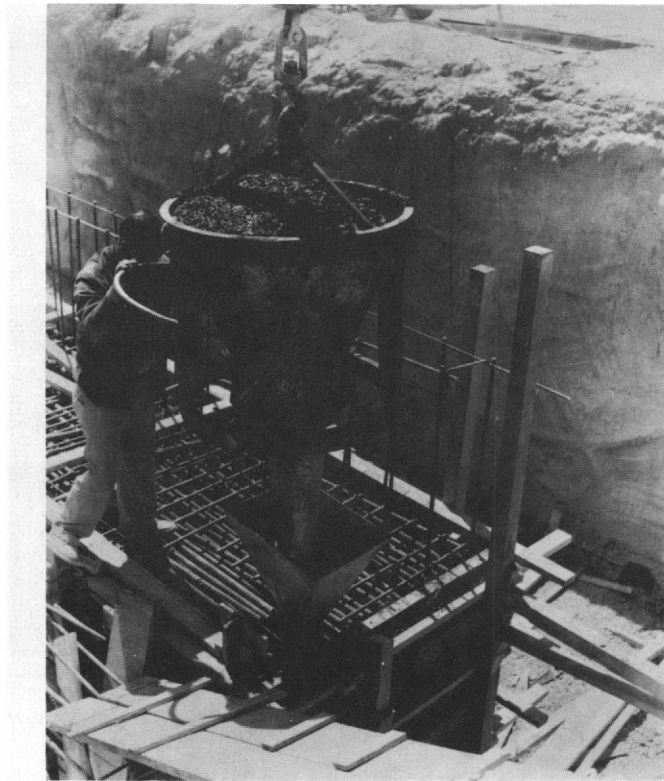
Pouring of west door pilaster concrete using tremies.
